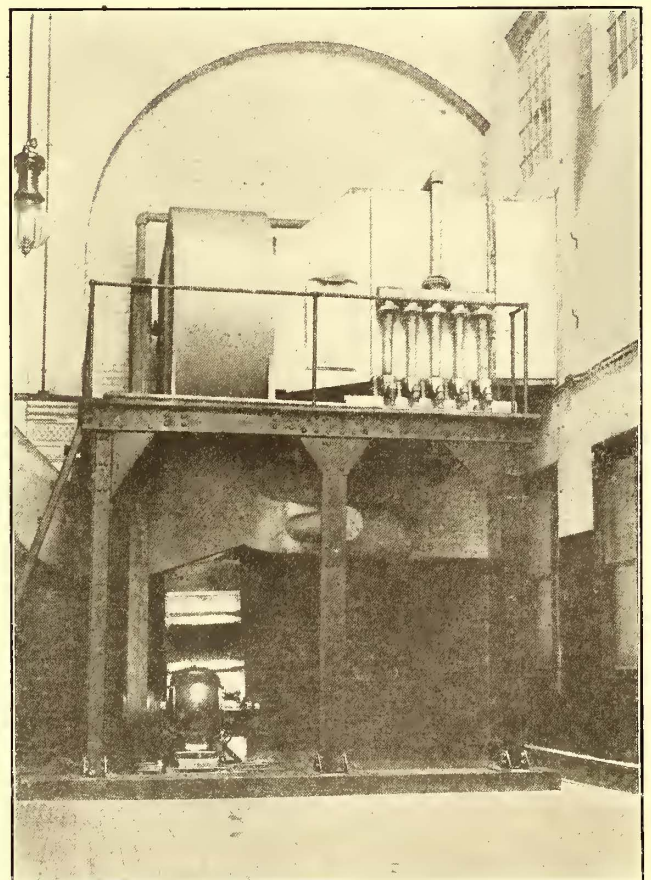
BLOWER AND HEATER COILS MOUNTED ON PLATFORM
